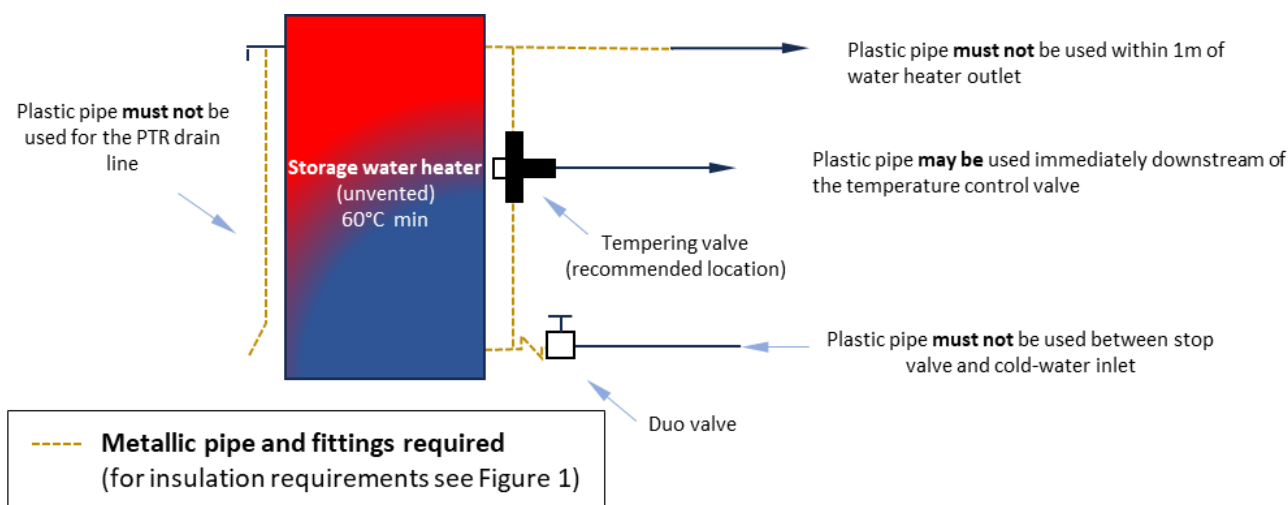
Metallic pipe requirements (plastic pipe and fitting exclusion zones)
